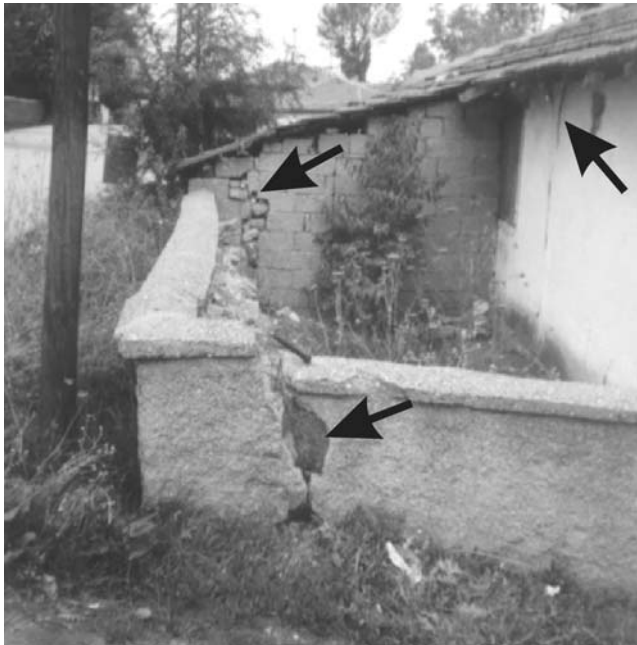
Damages to a garden wall and a light building due to heave of the Ankara Clay.
